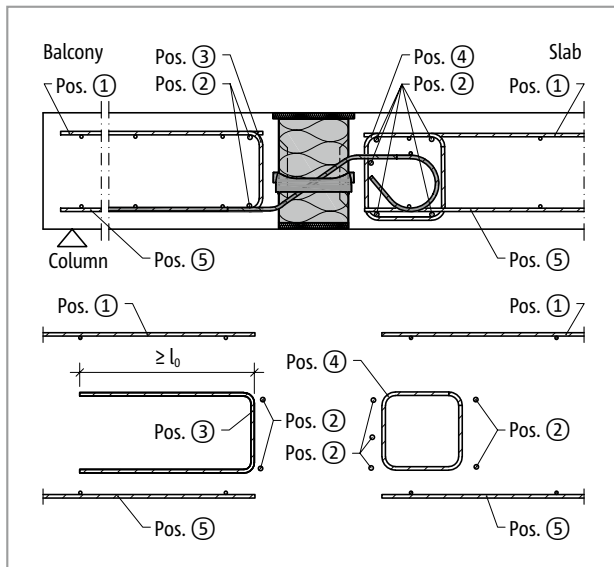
Schöck Isokorb® XT type Q-V1 to V4: On-site reinforcement
